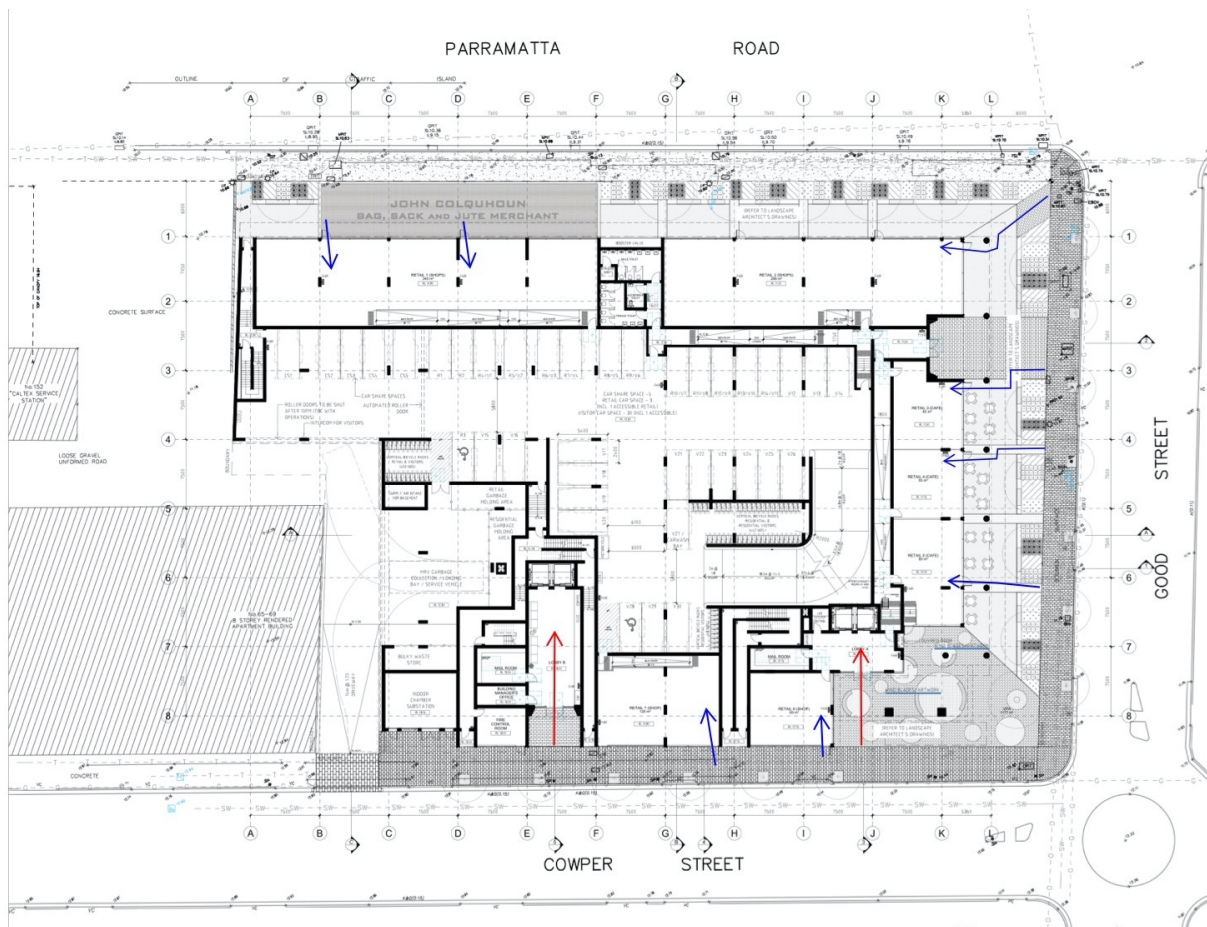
Ground floor plan - Street entries (blue - retail; red - residential)
